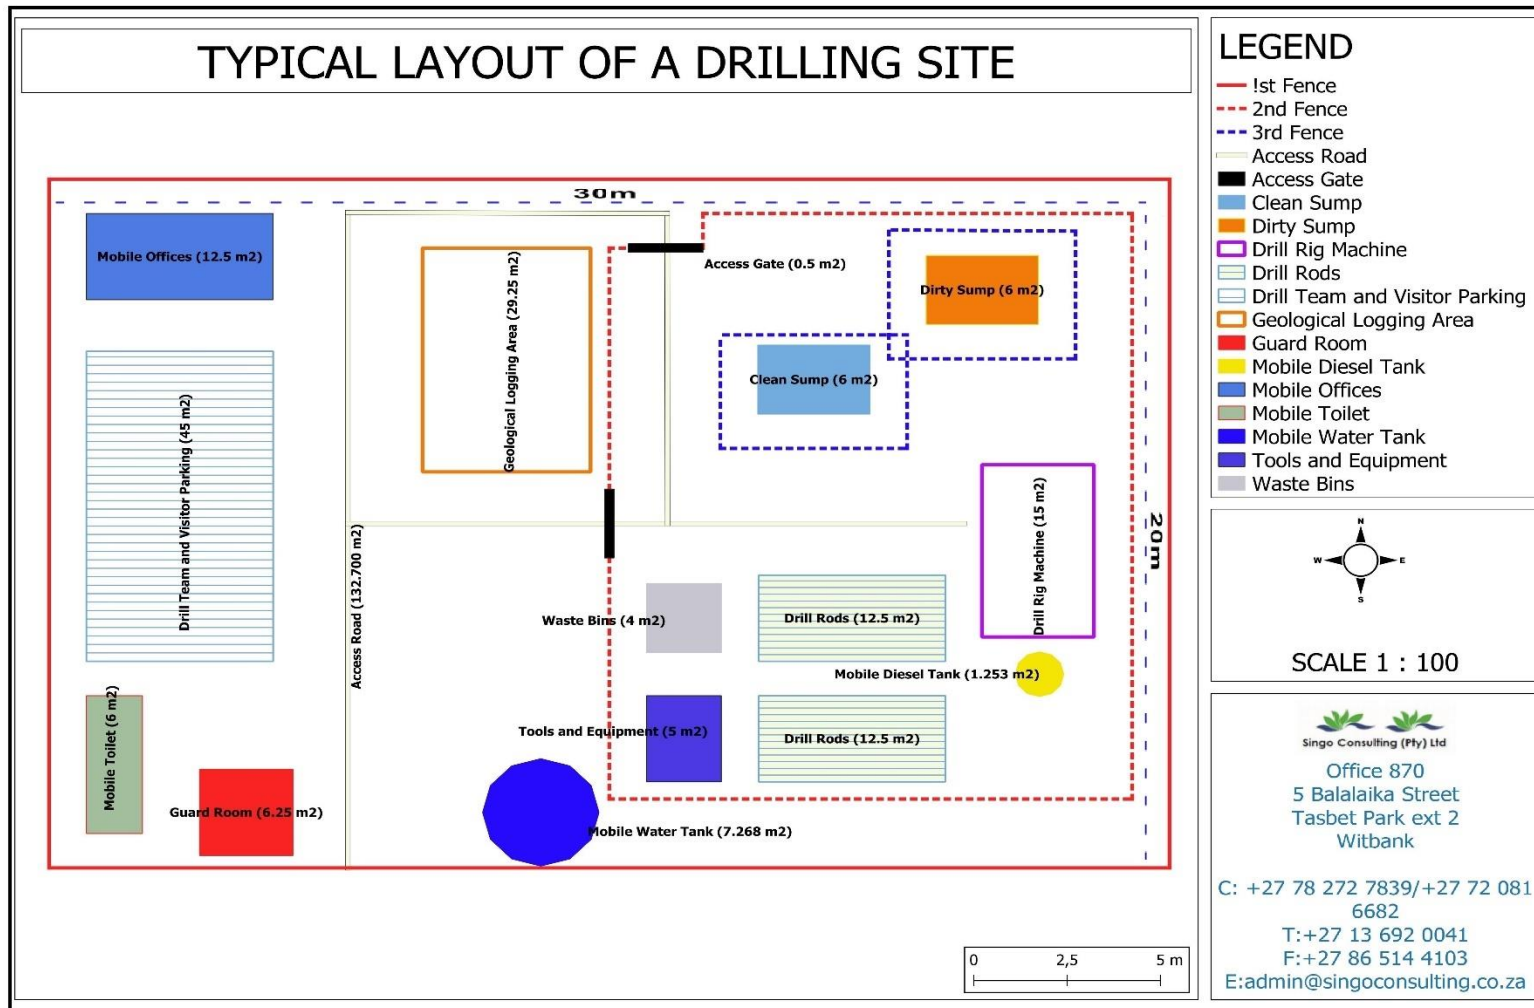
The drill site layout plan showing areas where specific activities will take place in the project area (Singo GIS, 2023)
